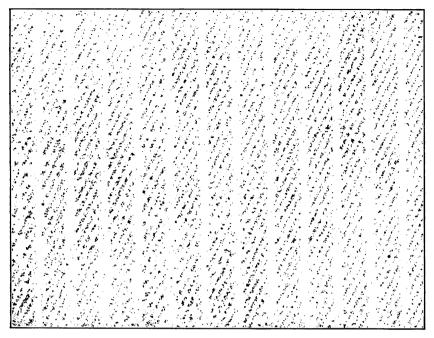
SURFACE OF STONE, FRESHLY DRESSED.
